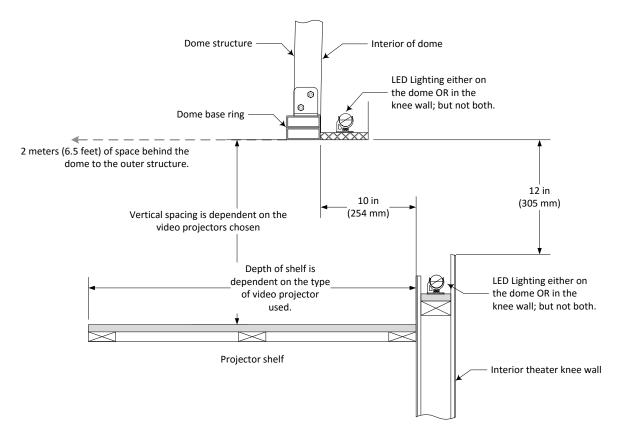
Cove: Dome and Knee Wall Spacing (Level Dome)
